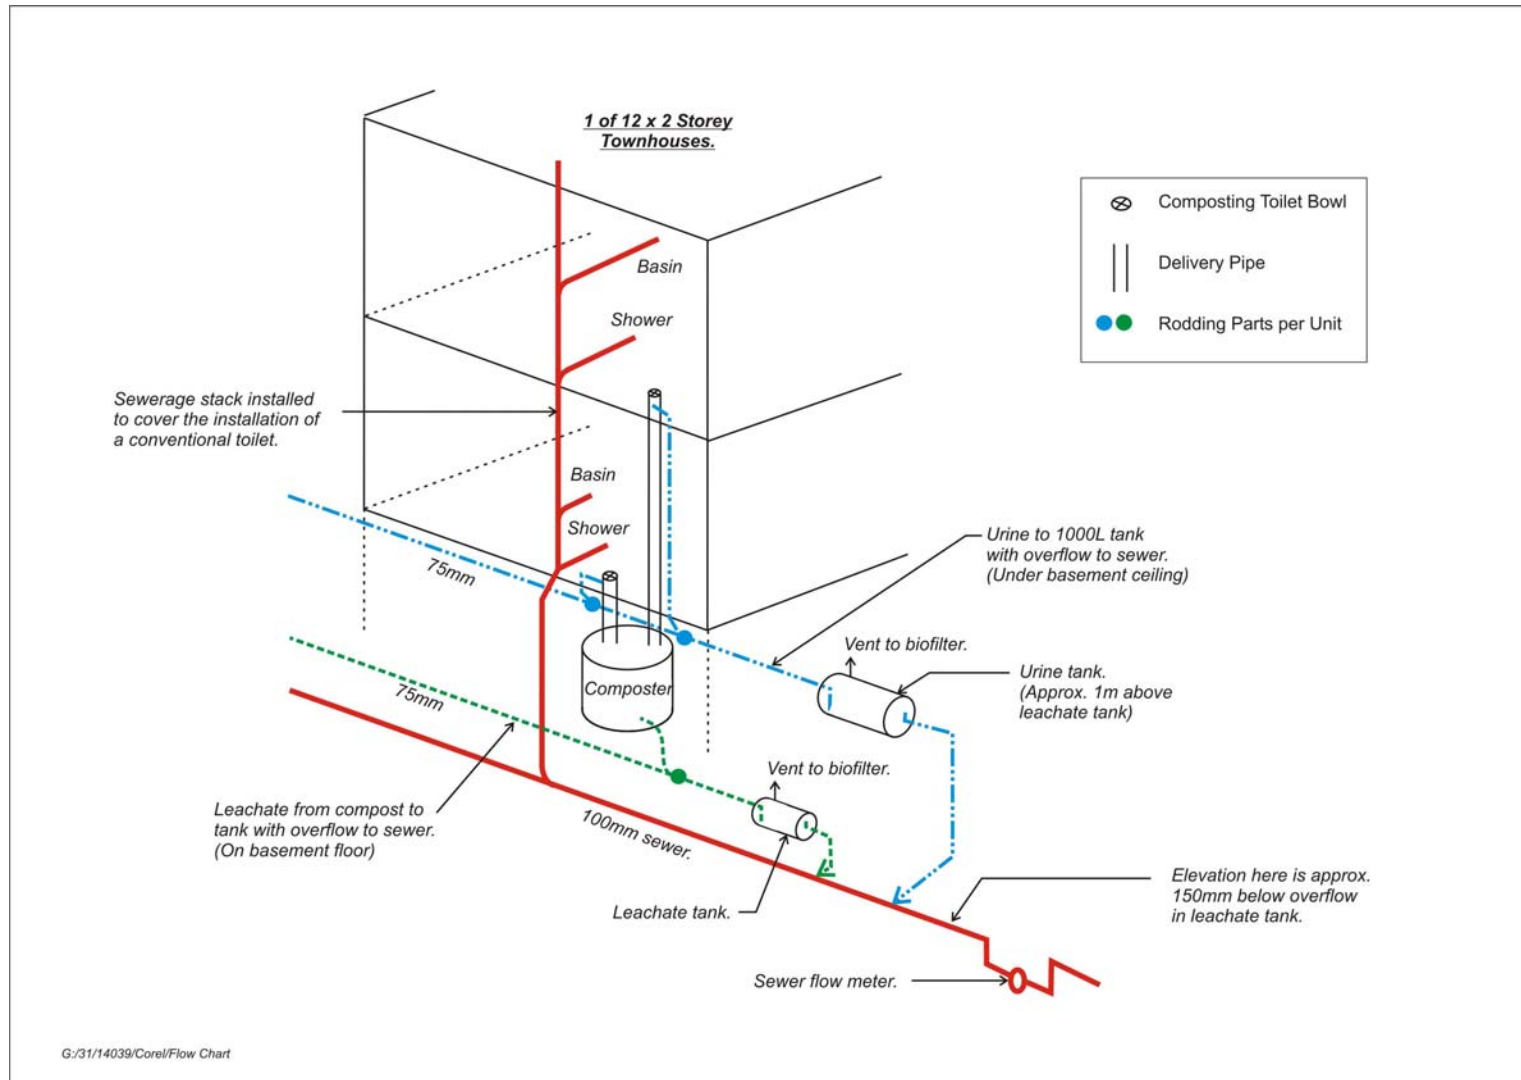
Drainage Plumbing for Composting Toilet in High Density Application
